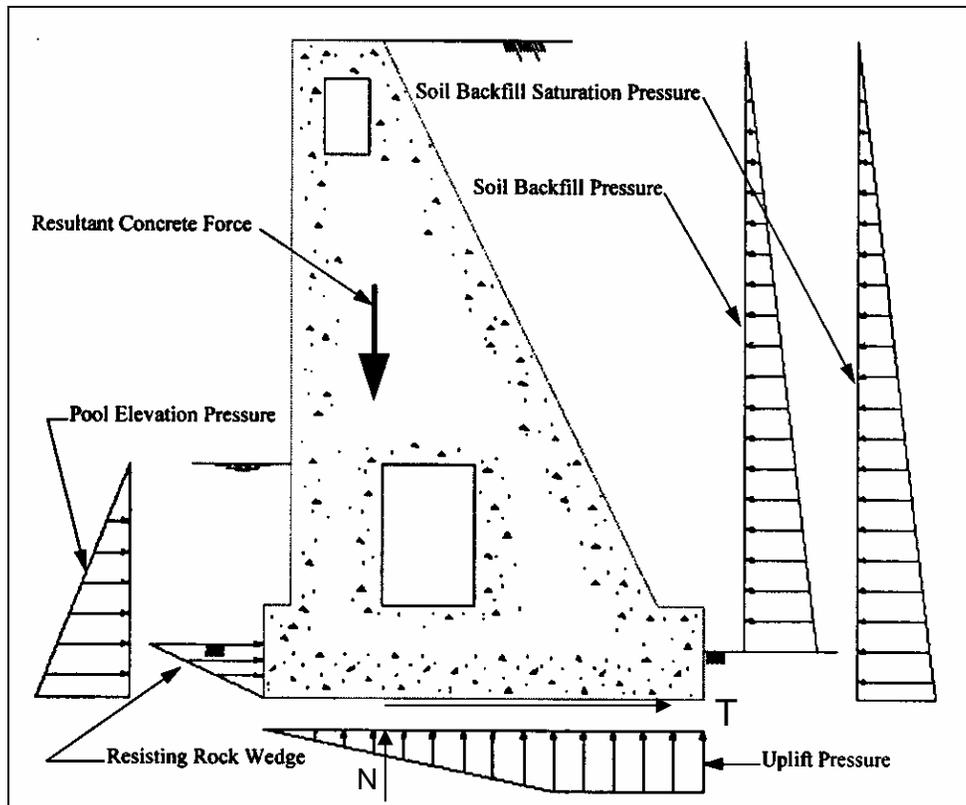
Typical free-body diagram for navigation mass concrete gravity structure
